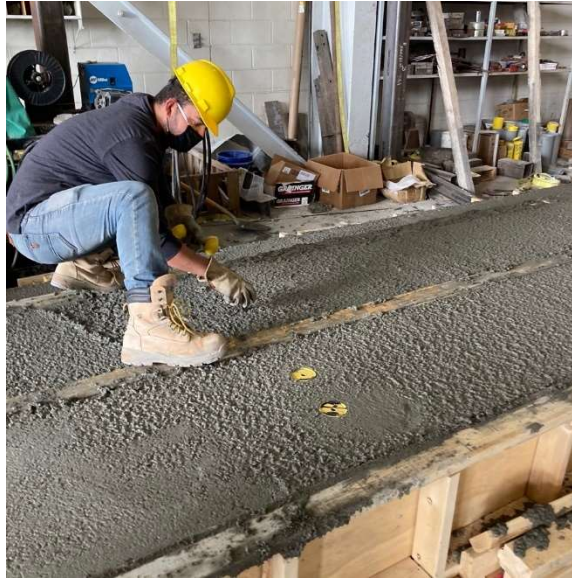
Placement of Lifting Anchors on Full-Scale Panels
